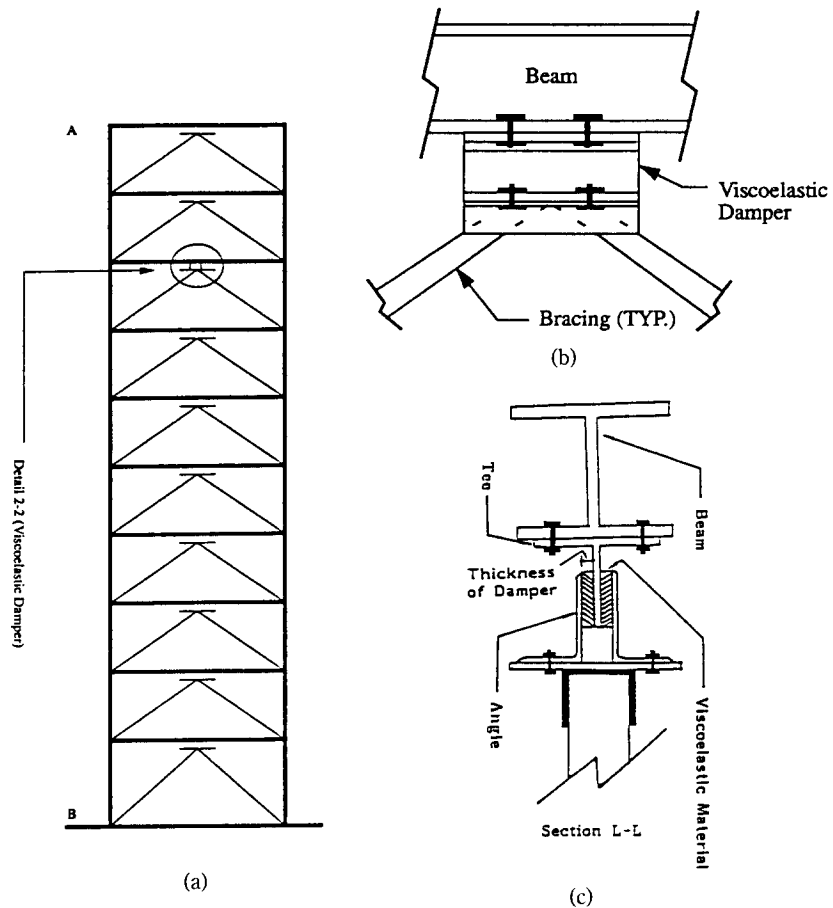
A 10-story building with proposed arrangement of VE dampers.
